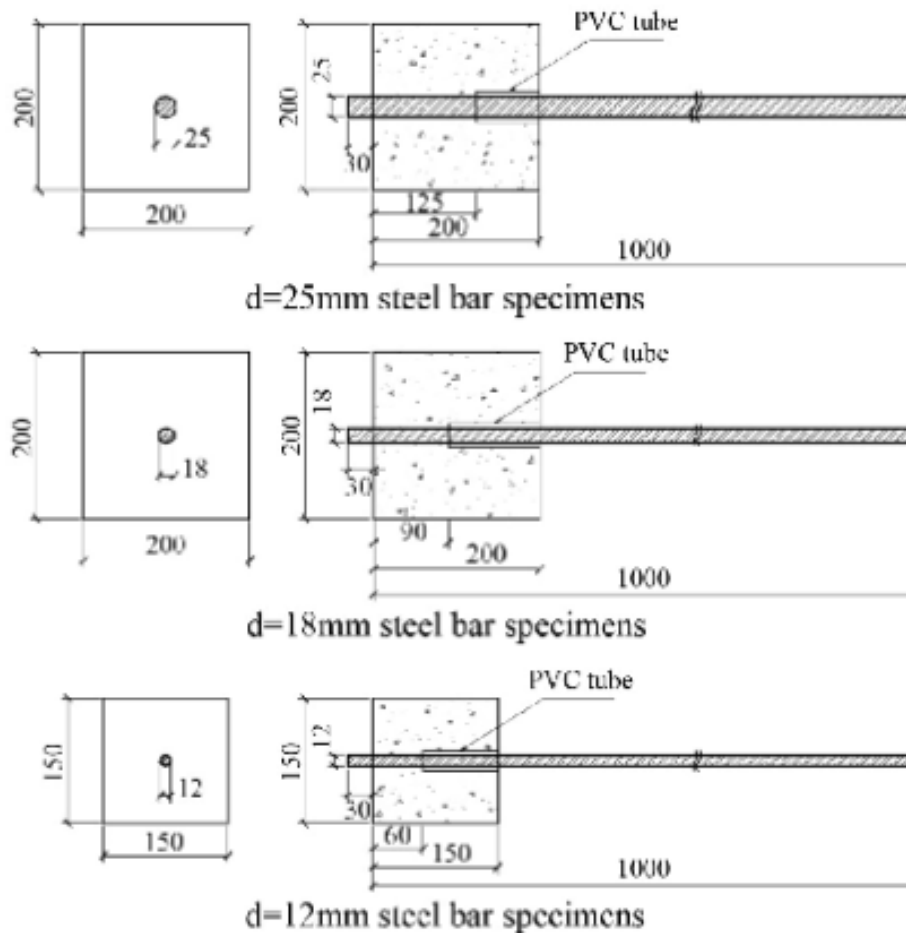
Details of the pullout specimens (Bai *et al.*, 2010)
